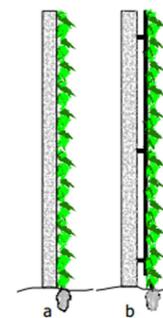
Shows the type of green façade in which the plants are rooted into the ground; use of self-climbing plants, a) directly on wall, b) with supporting structure (Mir, M. A. 2011).
